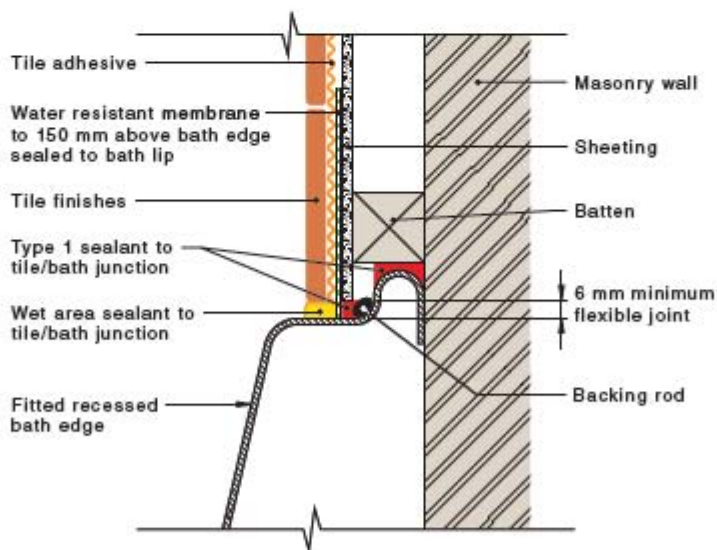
(B) — Bath with no shower over it — Fitted bath — Masonry wall with sheet spaced via battens
